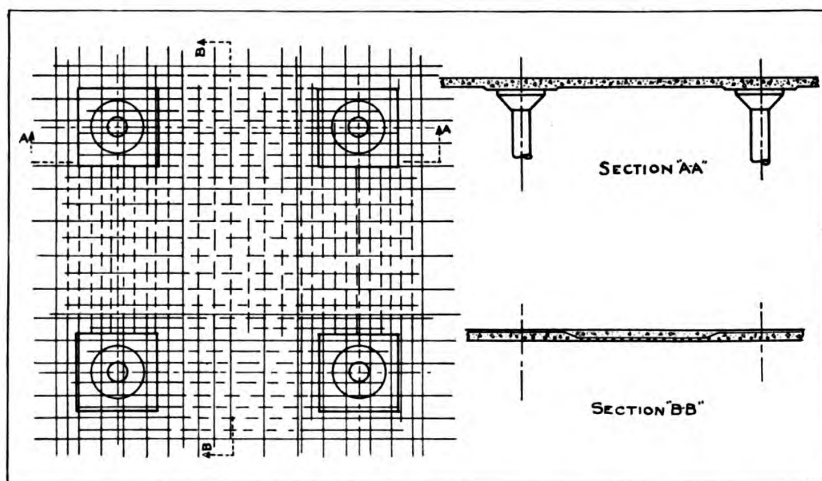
Diagram Showing Reinforcement and Slab Sections
